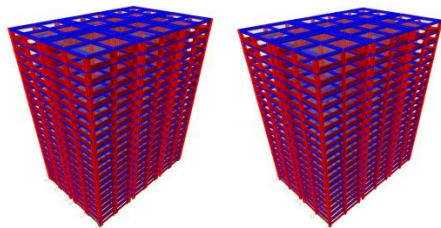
3D View of the RC Framed Masonry infill structure 35 % and 50% opening
